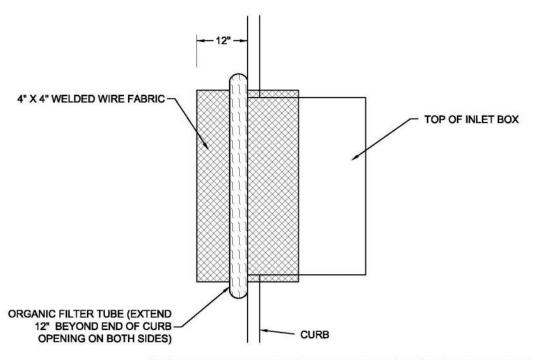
Schematics of 2"x4" Weir Curb Inlet Protection (Source: Modified from Washington Suburban Sanitary Commission Detail SC-16.0)
